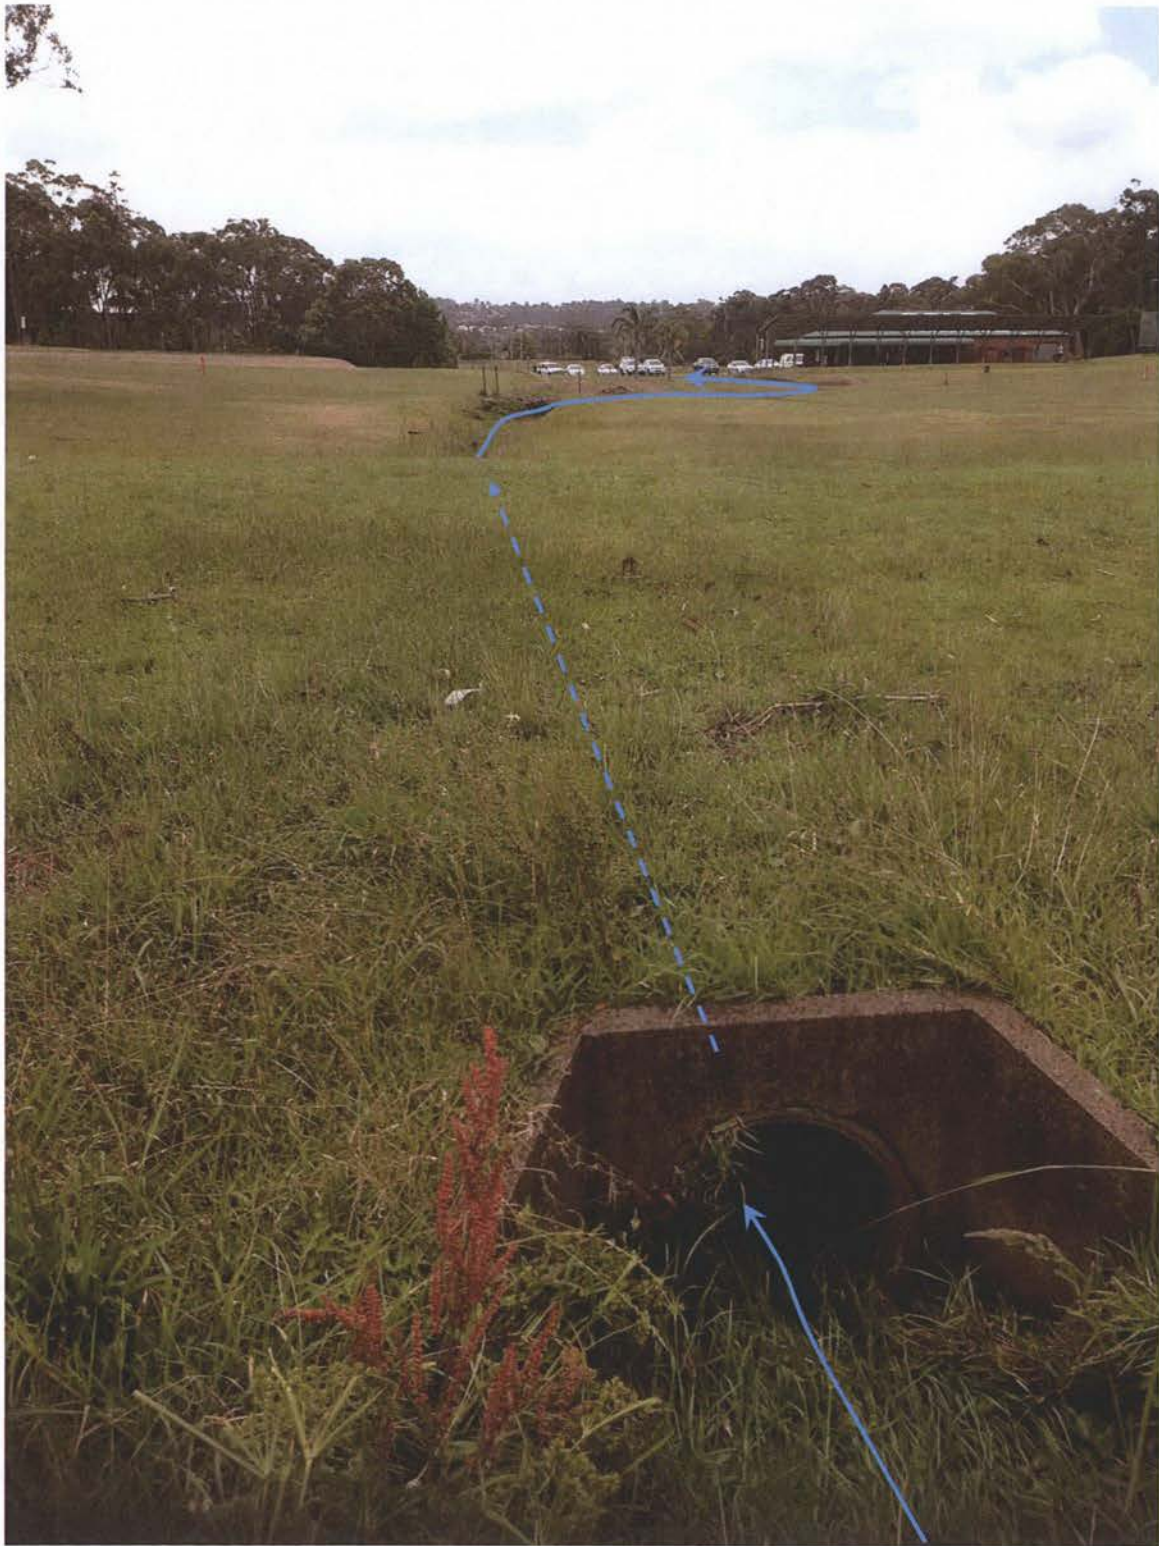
Drainage line 1 - central portion showing pipe section (forefront) and stream channel (background).
